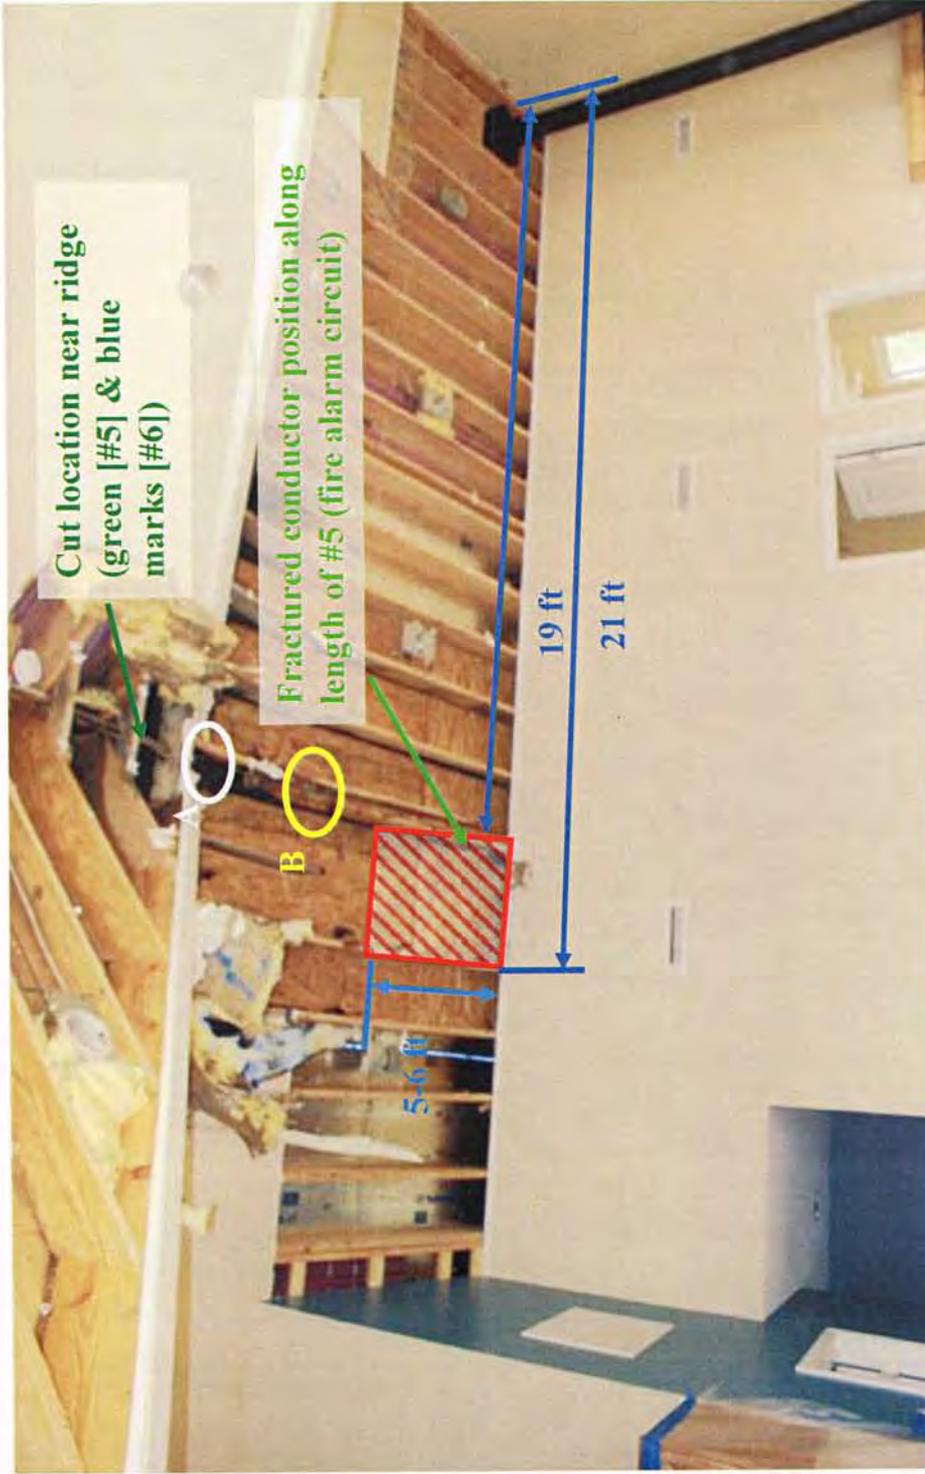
View looking eastward toward the ceiling/attic space above the living room. Certain characteristics of the collected wiring (items 5 and 6) and the routing of wiring to master bedroom lighting are noted. The distance from the cut end of item #5 to the mechanically fractured conductor was 8-feet, 10-inches as shown. Measurements indicated regions of electrical activity about 22-inches (A) and 68-inches (B) from the field cut near the roof ridge. Region 'B' was sectioned from the collected wiring by others during the September 27, 2012, joint examination.
